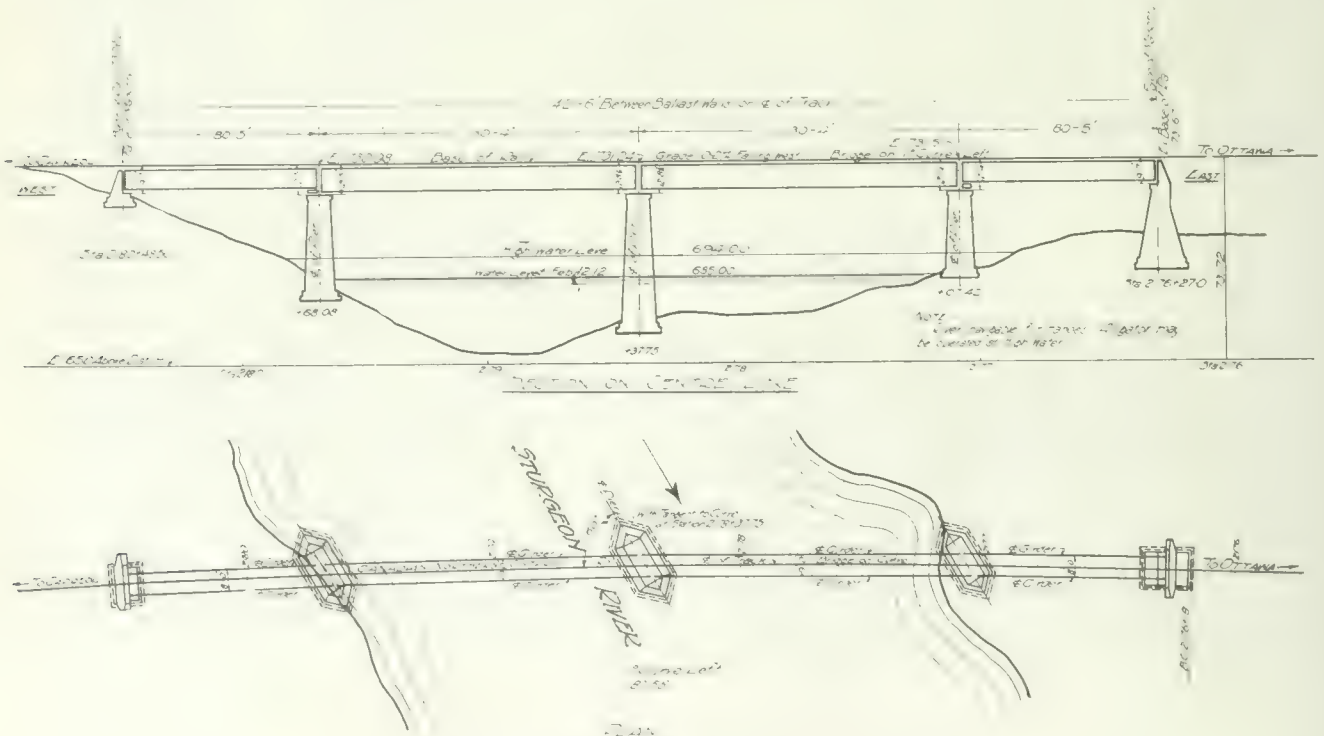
Plan and Elevation of Sturgeon River Bridge.
